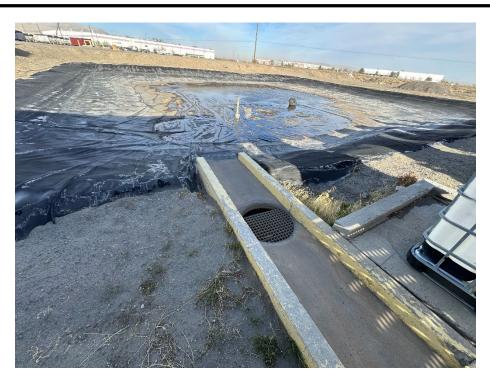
Stormwater pond spillway 11/11/24. *Facing northeast.
